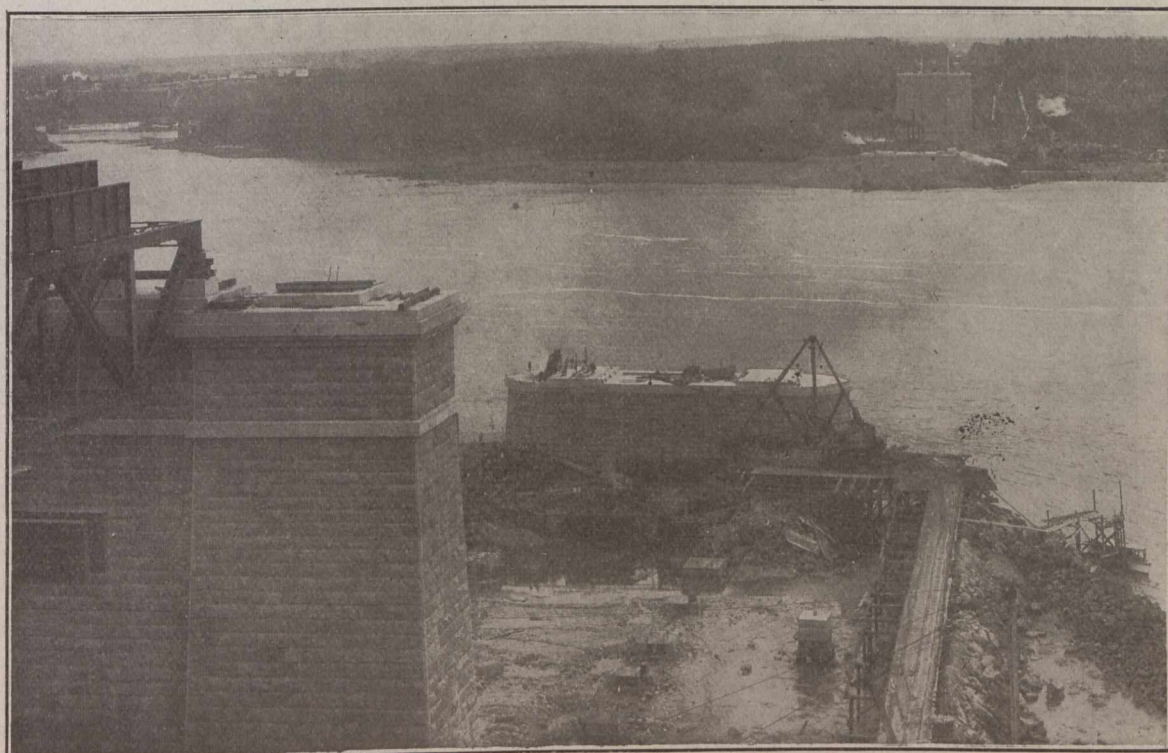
General view of the bridge site from the north shore, showing the completed masonry on both sides of the river.
